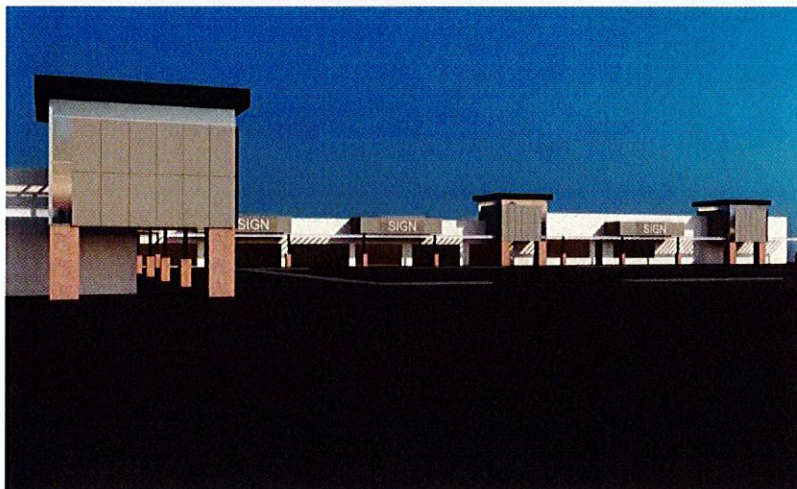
Proposed Rendering of Façade Improvements – Looking North.
